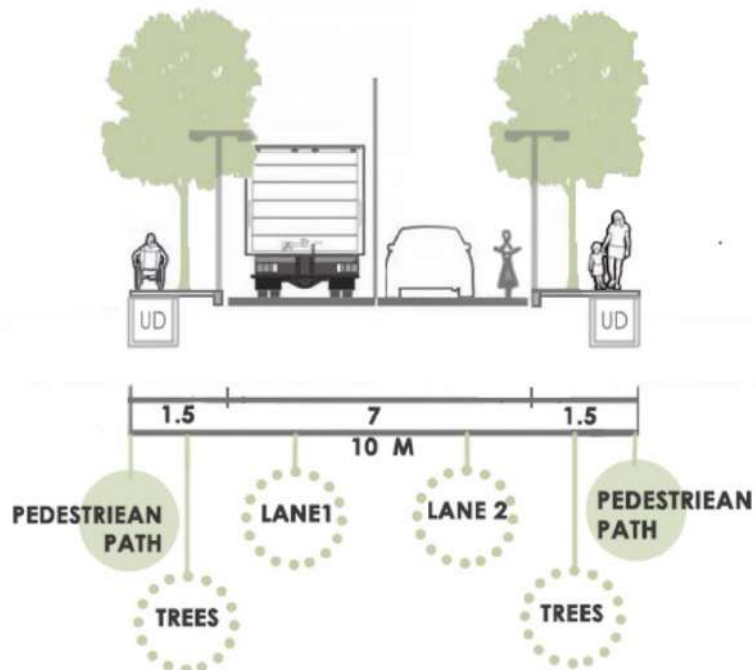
Typical layout of proposed 10m road (All Dimensions in meter)
